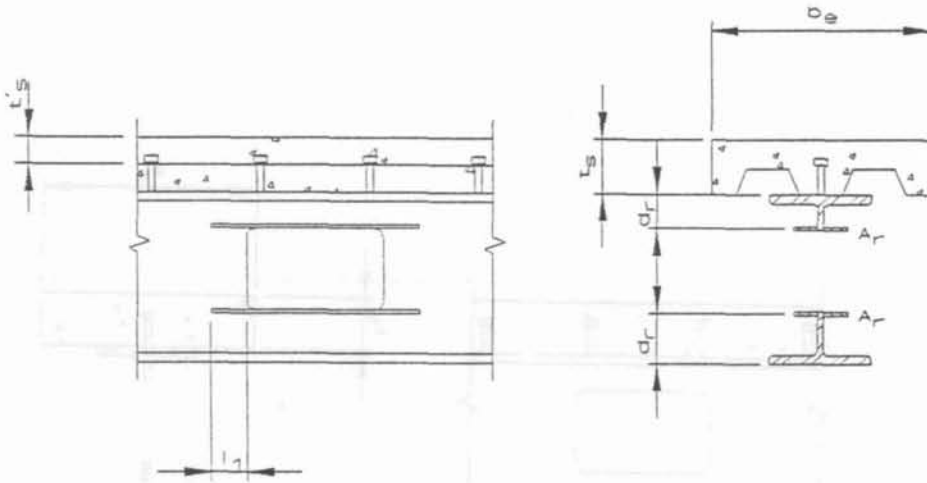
(c) Opening Configuration for a Reinforced Composite Beam with Longitudinal Ribs
